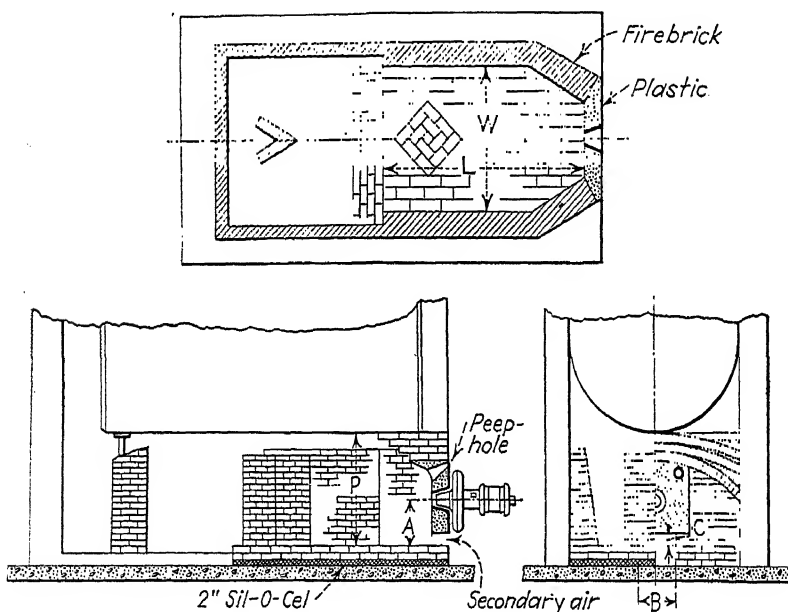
General construction of furnaces for horizontal return-tubular boilers.
